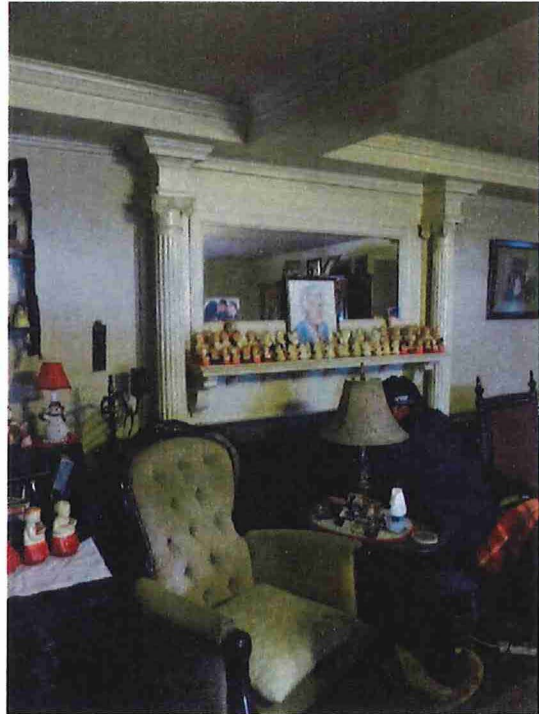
southeast parlor - cased timbers & ca. 1900-20 mantel
